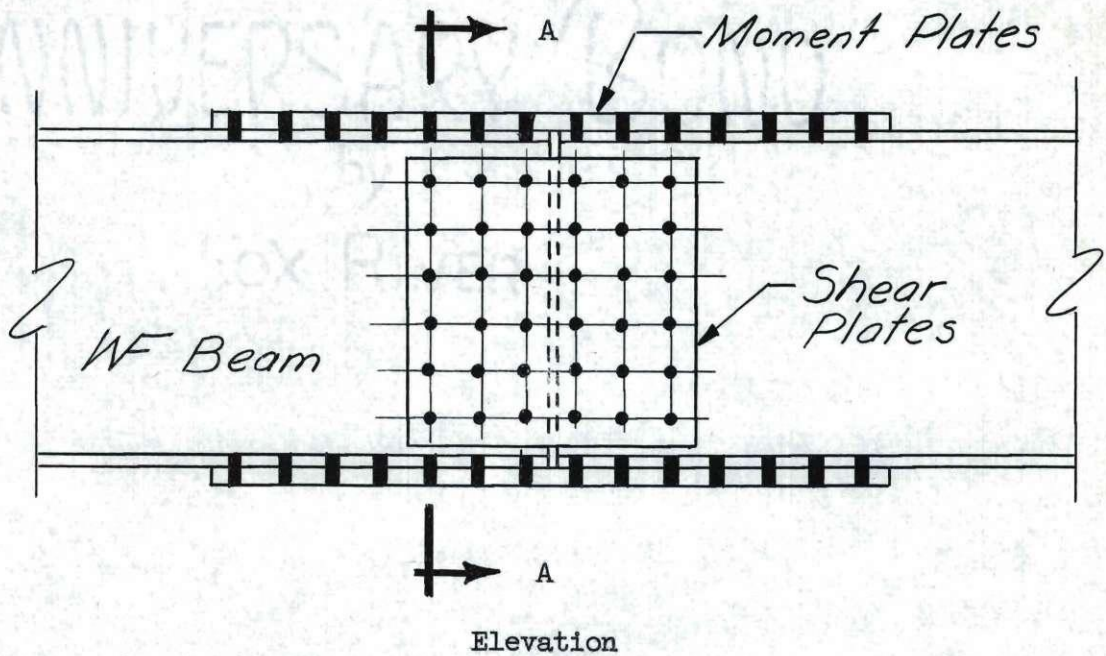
Typical Splice for Wide Flange Beam Under Current Practice
